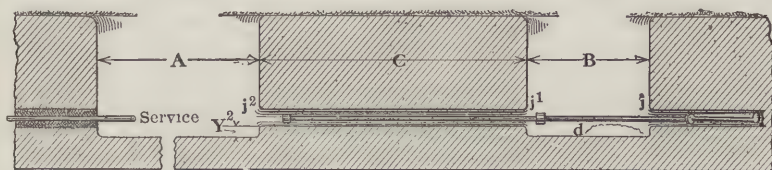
LONGITUDINAL SECTION OF POCKET-AND-DRILLED TRENCH FOR SUPPLY PIPE
